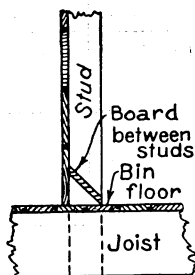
Bevel-edged boards cut between the studs facilitate the cleaning of bins
